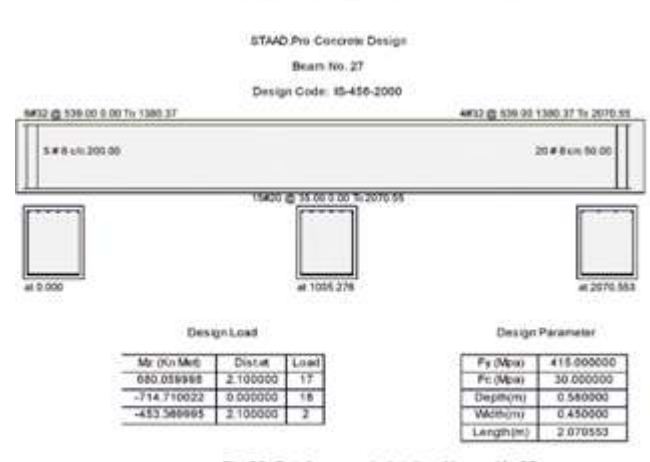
Reinforcement details of beam No.27 (Tank with full water condition in Seismic Zone IV)
